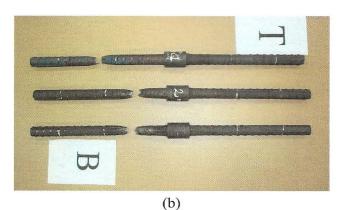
View of failed specimens of 32 mm diameter reinforcing bar couplers during static tensile tests carried out after cyclic tensile tests
